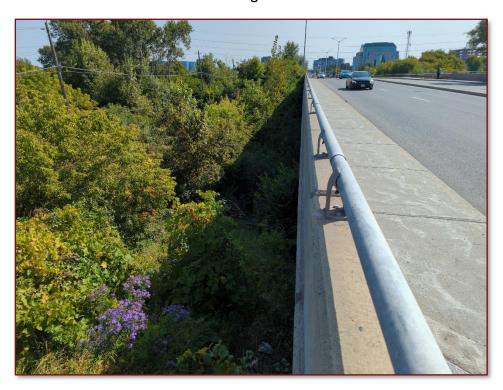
St. Laurent Boulevard – Paved Roadway, Artificial Slope, and Utilities
